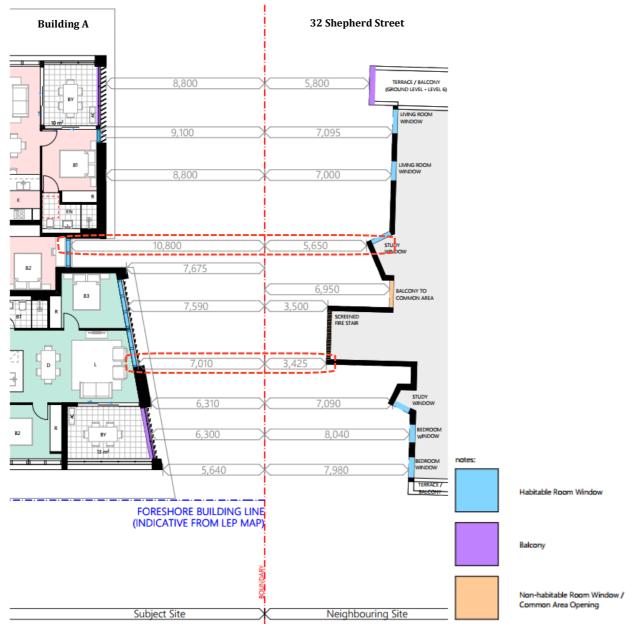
Proposed building separation with 32 Shepherd Street - levels 10 - 16
